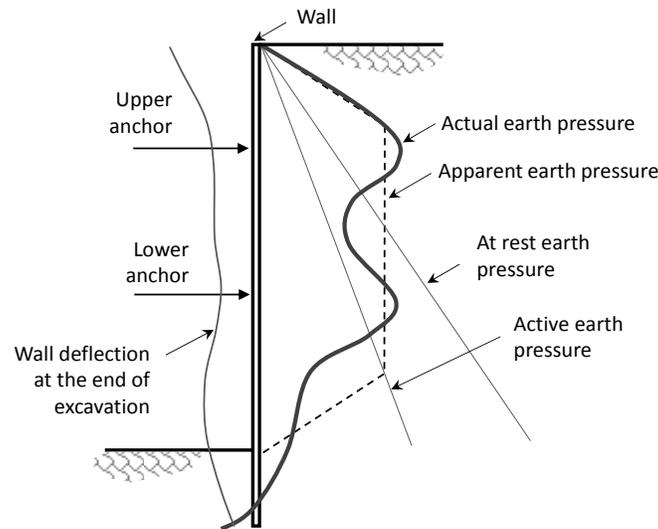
Earth pressures and wall deflection in anchored walls, modified from [3]
